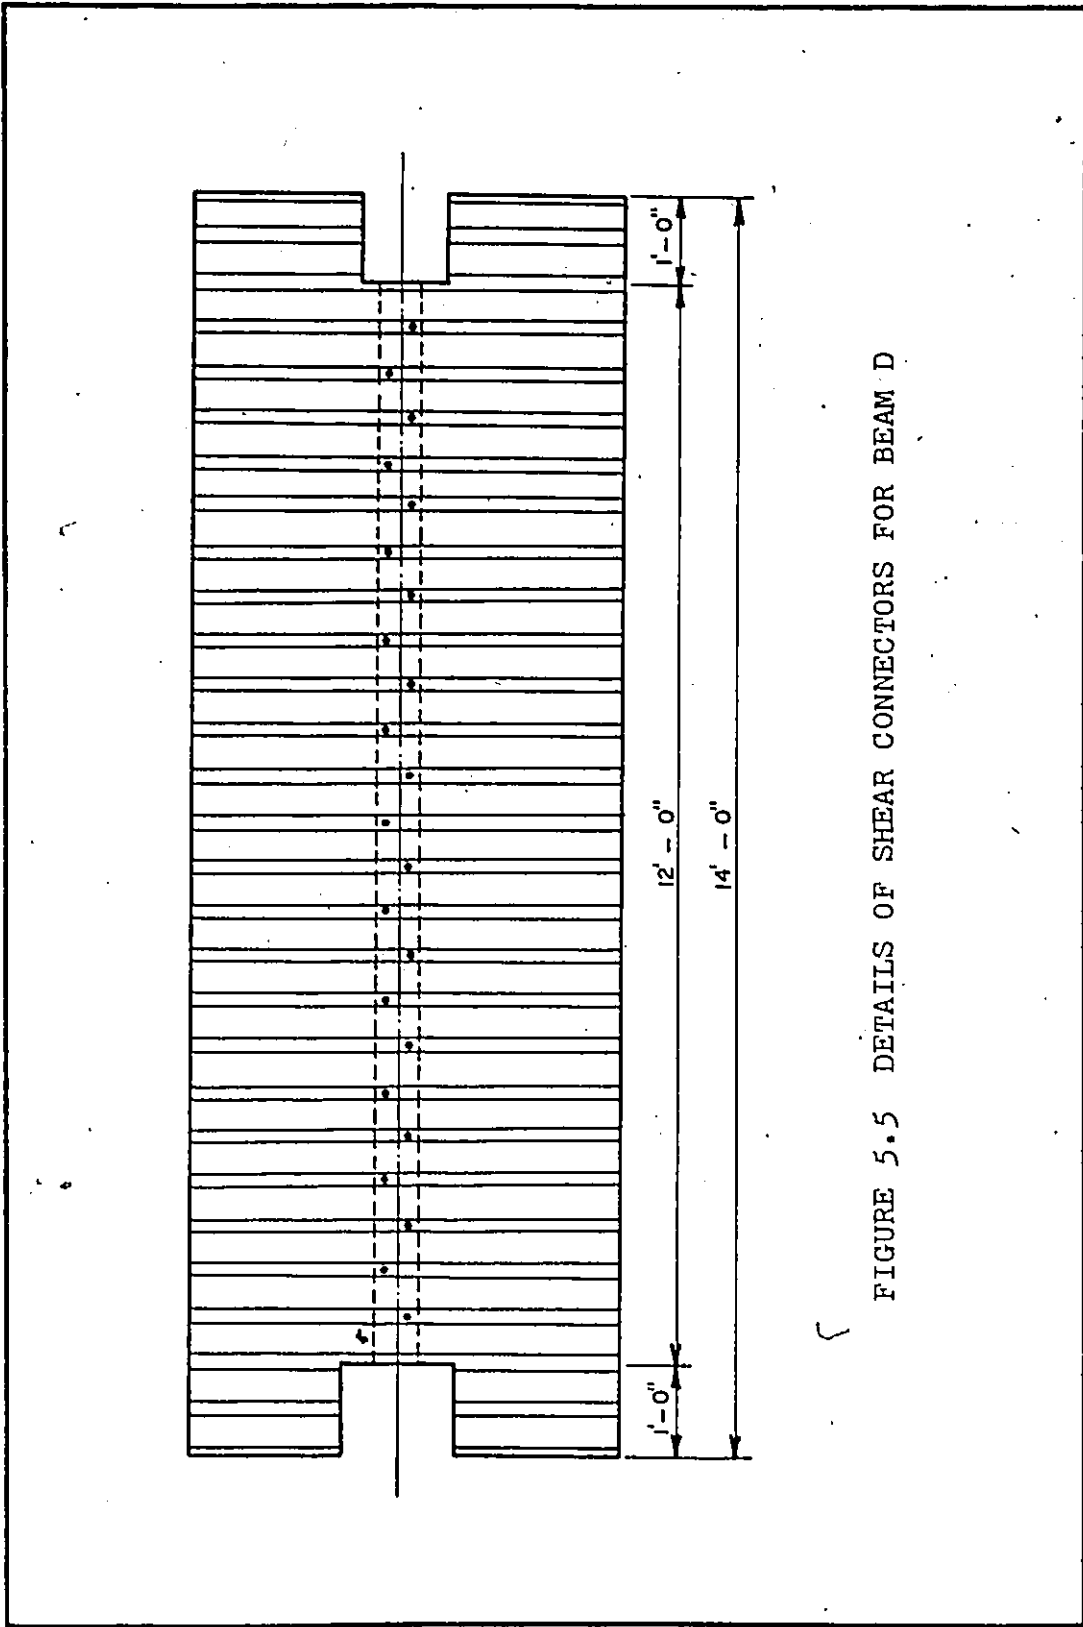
DETAILS OF SHEAR CONNECTORS FOR BEAM D
